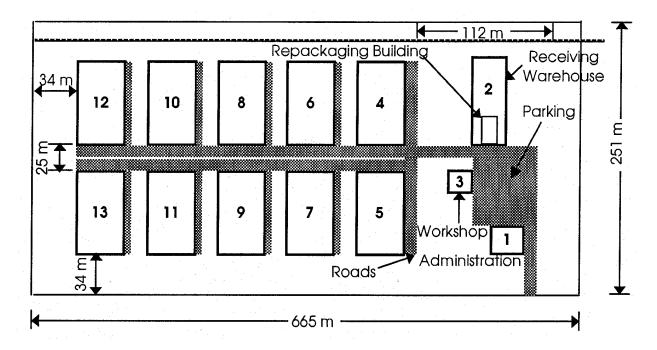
Site Layout of the Vault Storage Facility — Uranium Metal, 25% Case
